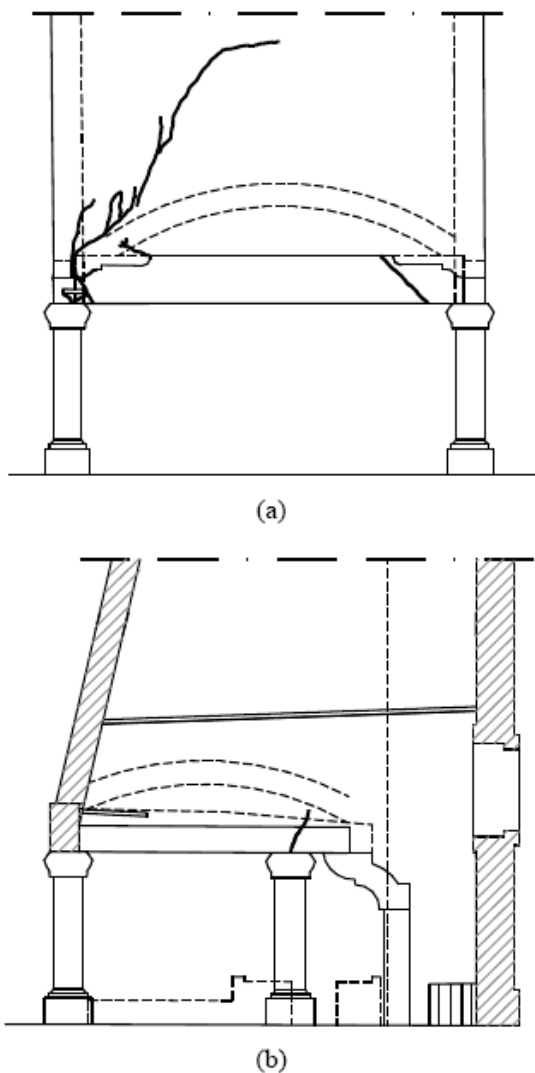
Geometry and observed cracking patterns: (a) main wall; (b) left side wall.
